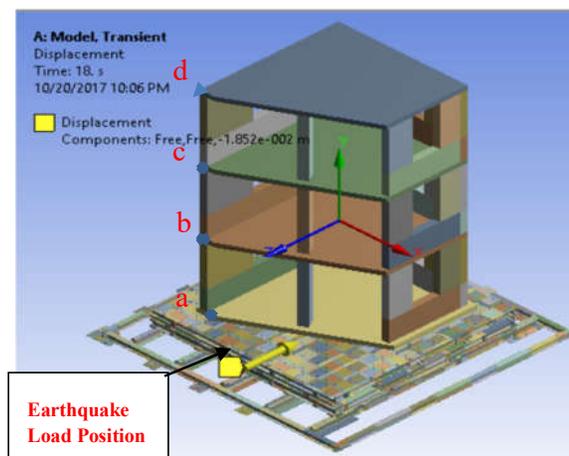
Application of an axial earthquake load on model of three-storey shear wall RC building on shaking table
